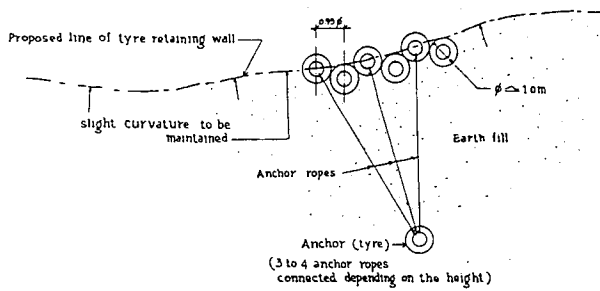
Plan view of Anchor and Facing Tyre Arrangement
